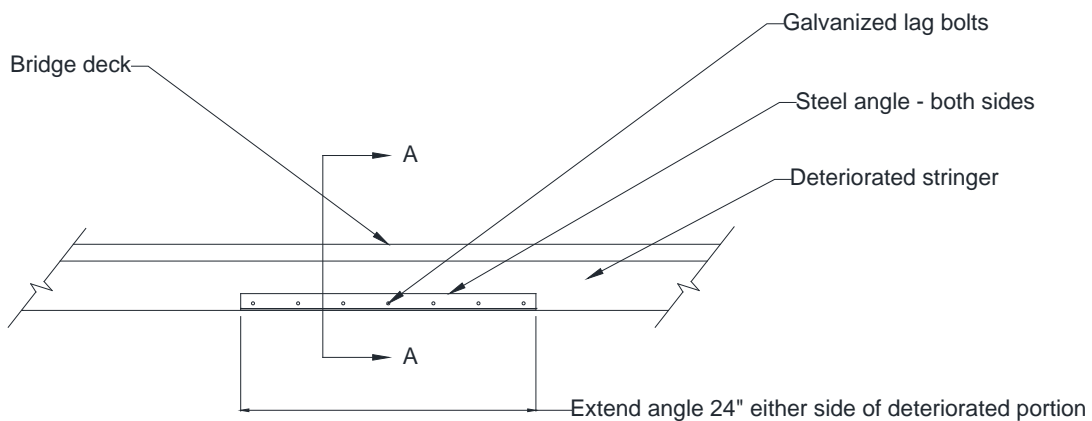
Strengthening of timber girder or stringer – flexural reinforcement, bottom angle
